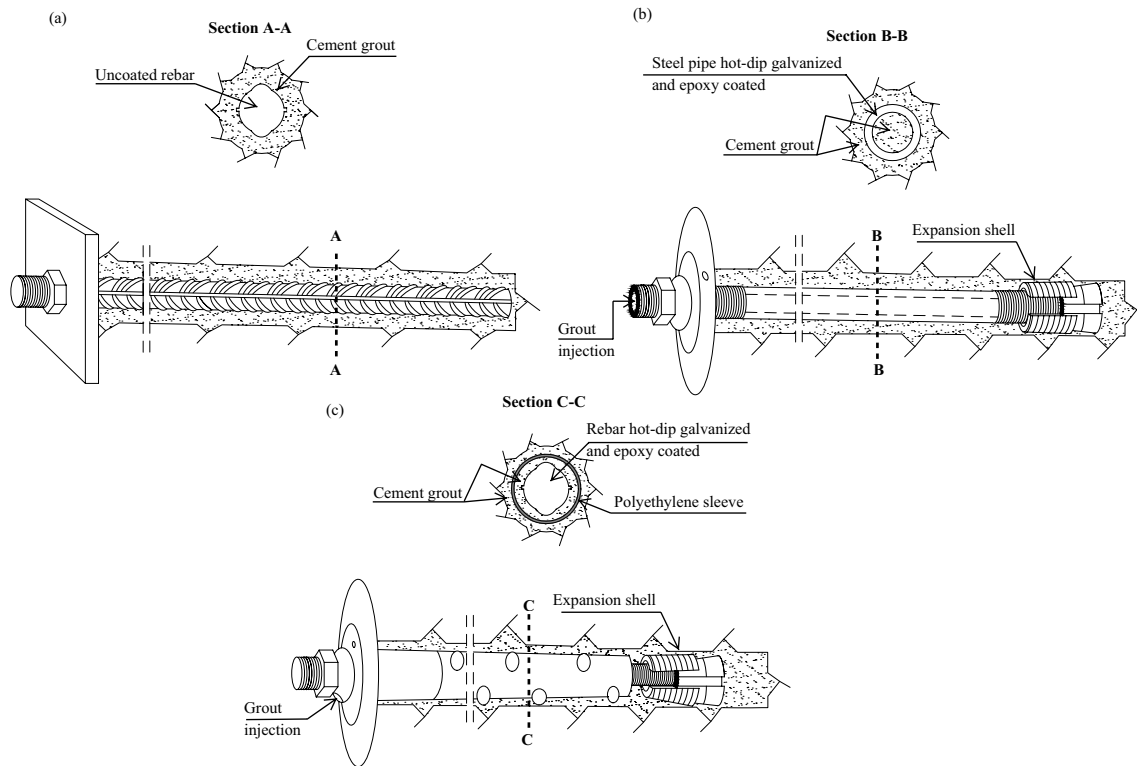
Some rock bolts used as permanent rock supports in Norwegian road tunnels. a Uncoated rebar cement grouted in the Haukeli road tunnel constructed between 1968 and 1969. The rebar is 20 mm in diameter and 2.4 m long (Pedersen and Hafsaas 1991). b Pipe bolt used in Byfjord and Mastrafjord subsea road tunnels constructed between 1989 and 1992. The 3-m-long rock bolt, steel pipe
